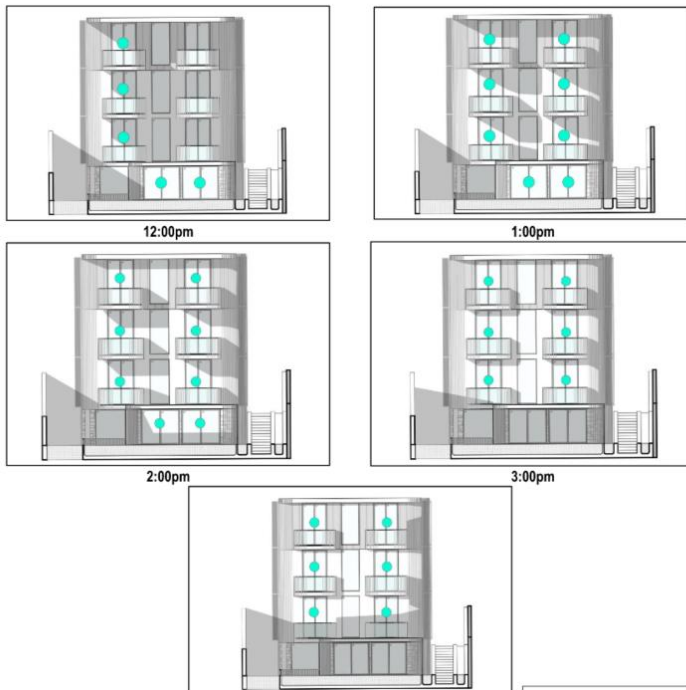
Solar Access to the Rear Elevation of the proposed development with the blue dot indicates solar access to windows (Source: Roth Architects)
